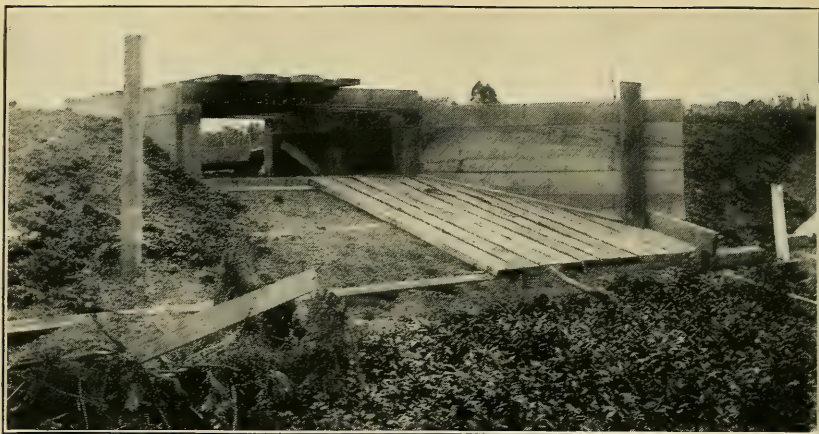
View showing construction of spillway-box and downstream apron in dam.
